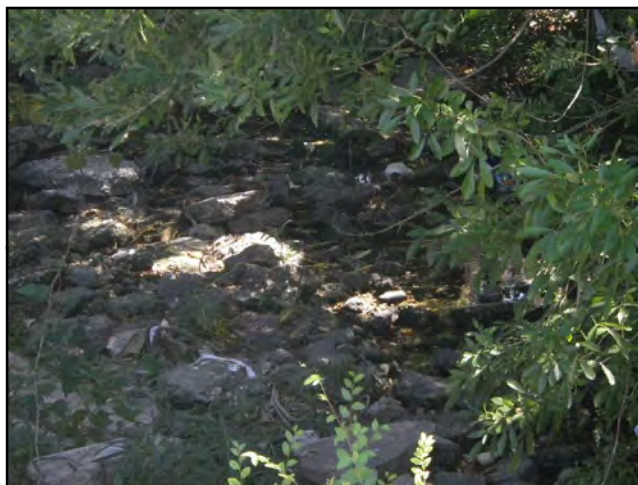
Looking east at Janowski Ditch (riprap in channel bottom)
